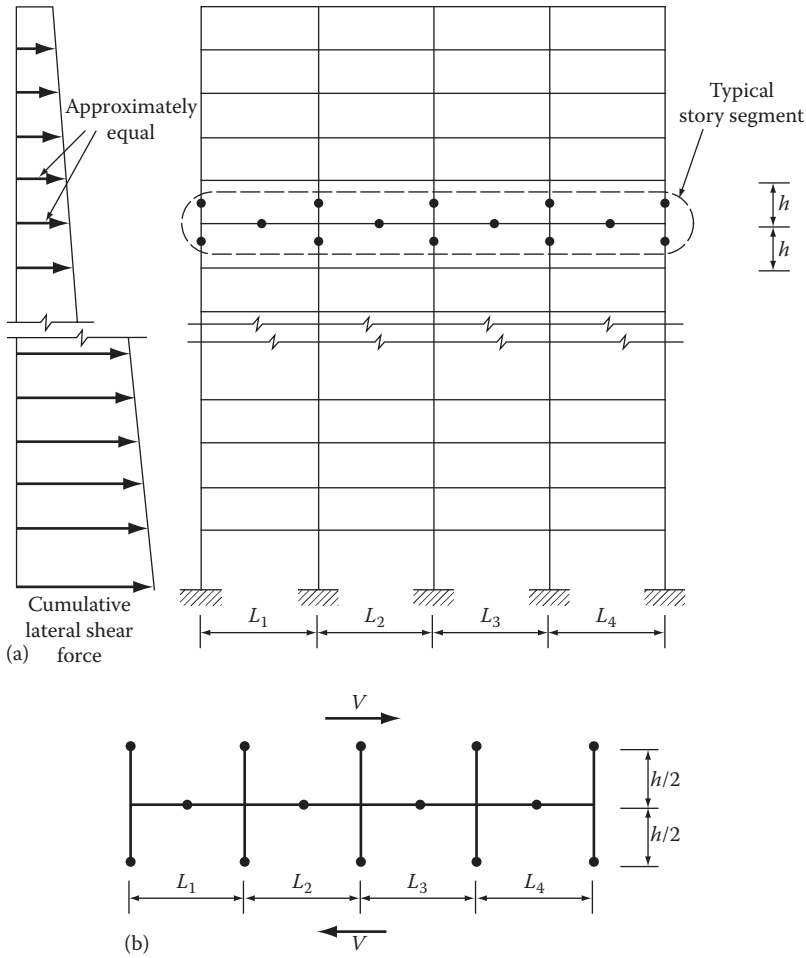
Portal frame shear deflections: (a) Frame subjected to lateral loads and (b) typical story segment.
